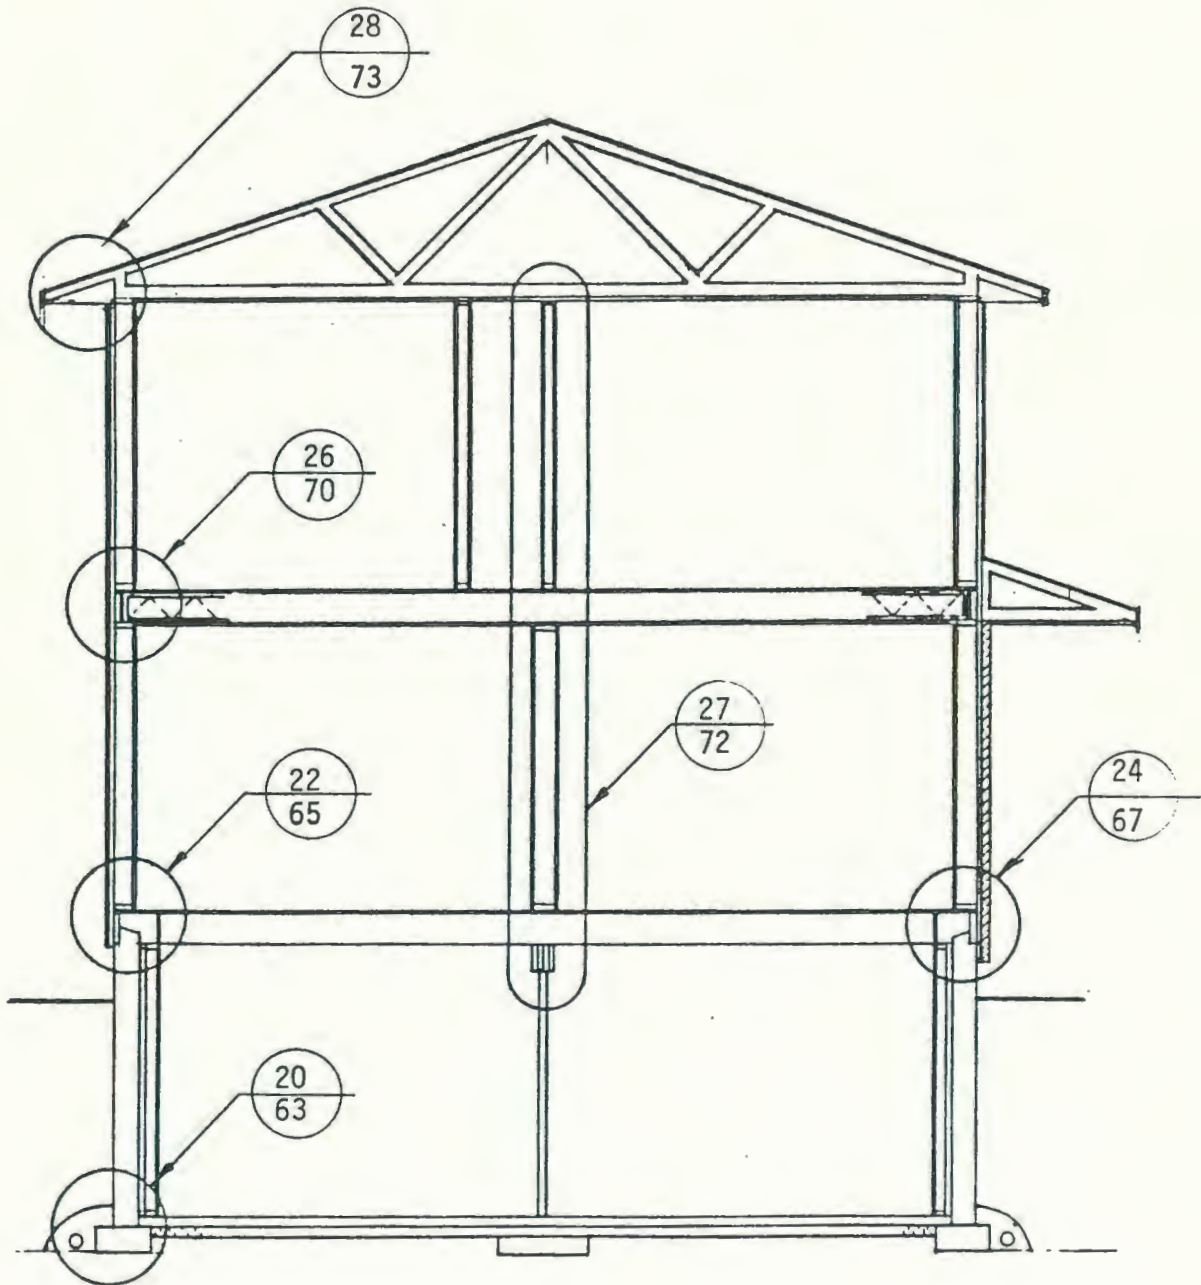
Location of Key Details on Cross Section - Alberta Demonstration House
